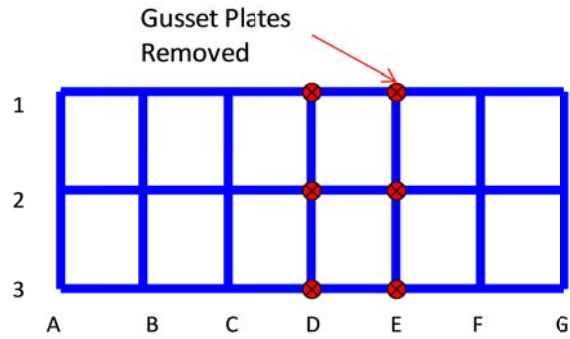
Damage Case #3 – Removal of Gusset Plates
